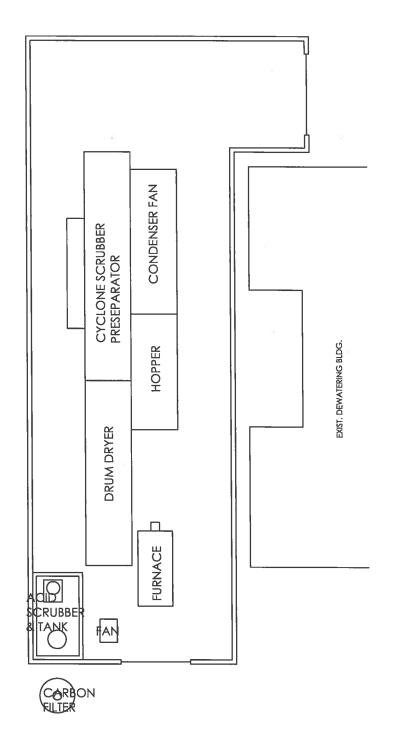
REVISED ANDRITZ BUILDING PLAN SCALE: 3/4" = 1'-0"
